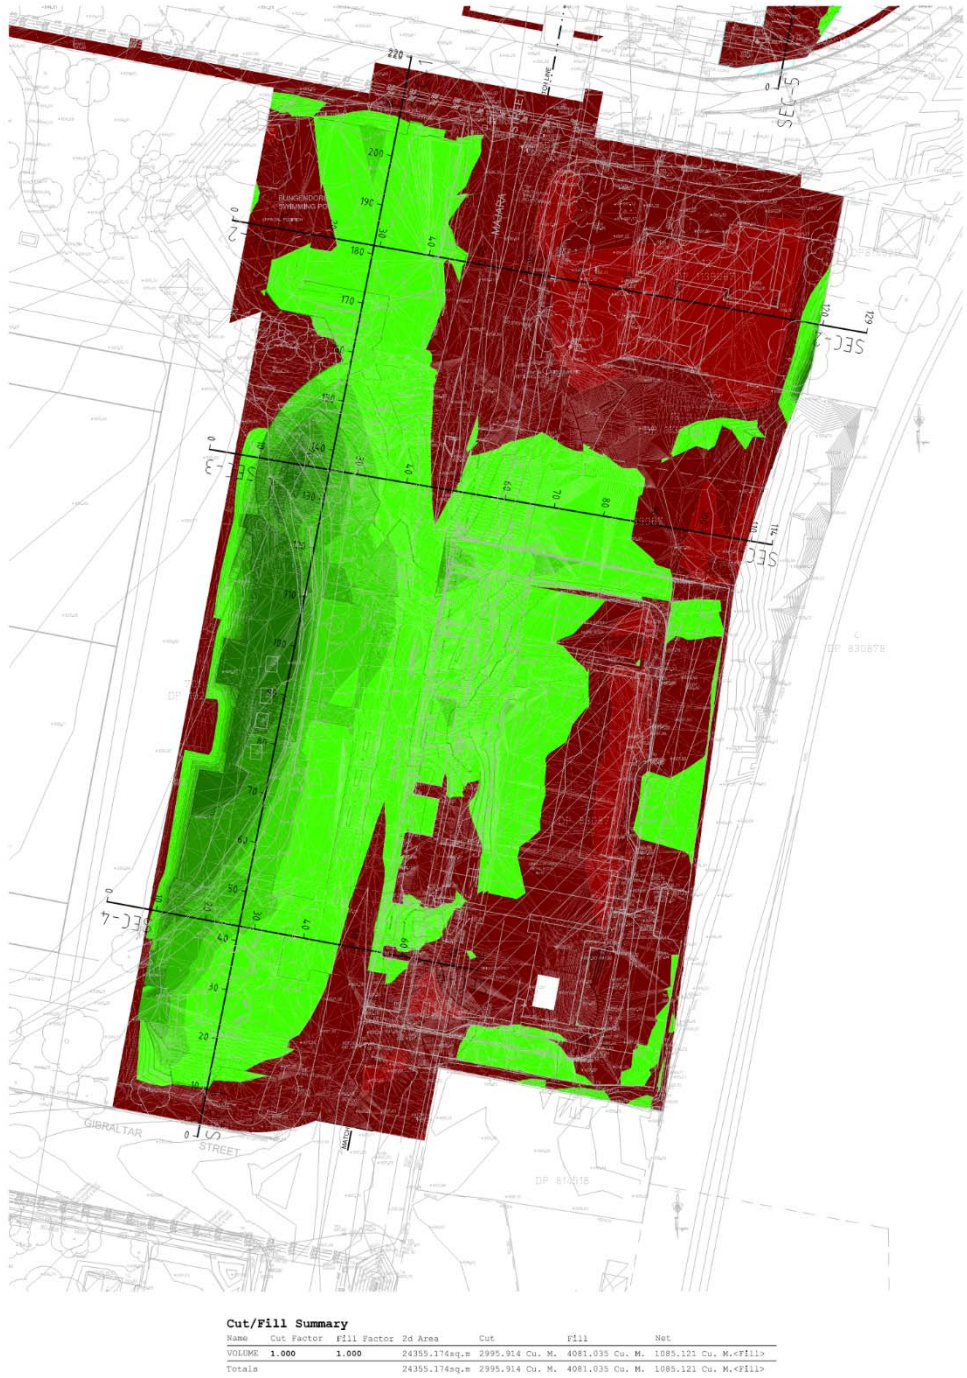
Earthworks Plan and Quantities for proposed building envelopes
